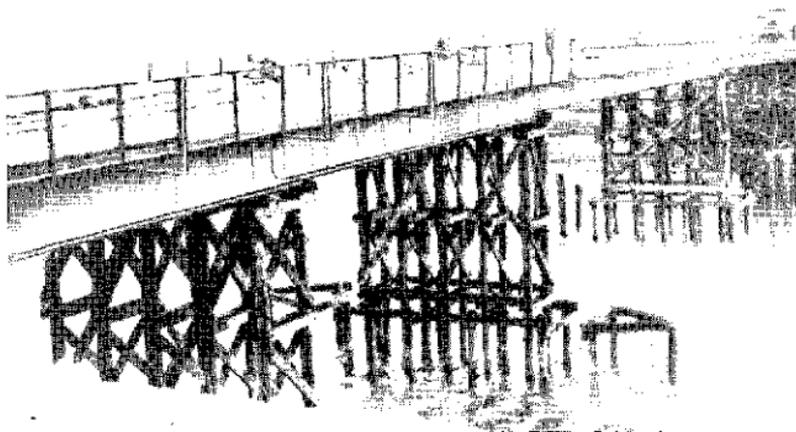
Simple stringer bridge with steel I-beams and timber flooring.
